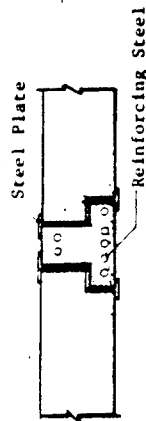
BEAMS FOR PRECAST ROOF PANELS.
